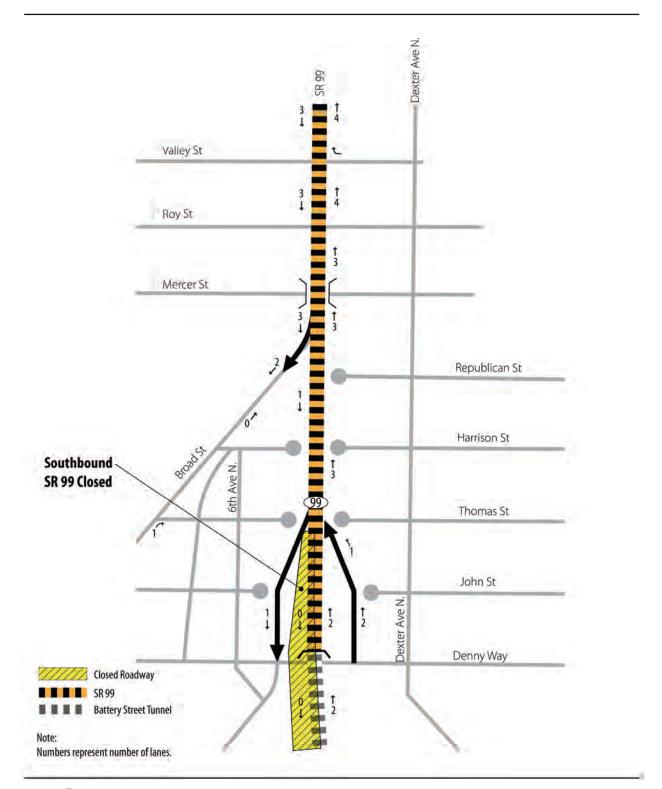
Elevated Structure Alternative Traffic Stage 5 Roadway Configuration (North)
